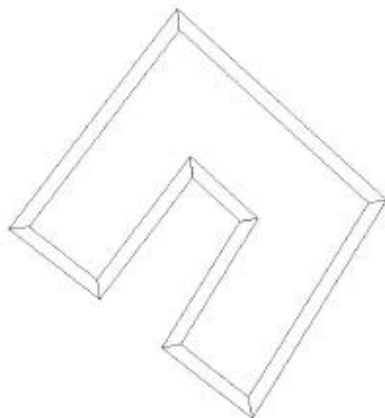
Typical floor plan for scheme 6 with five meter deep thermal zones along the perimeter.
